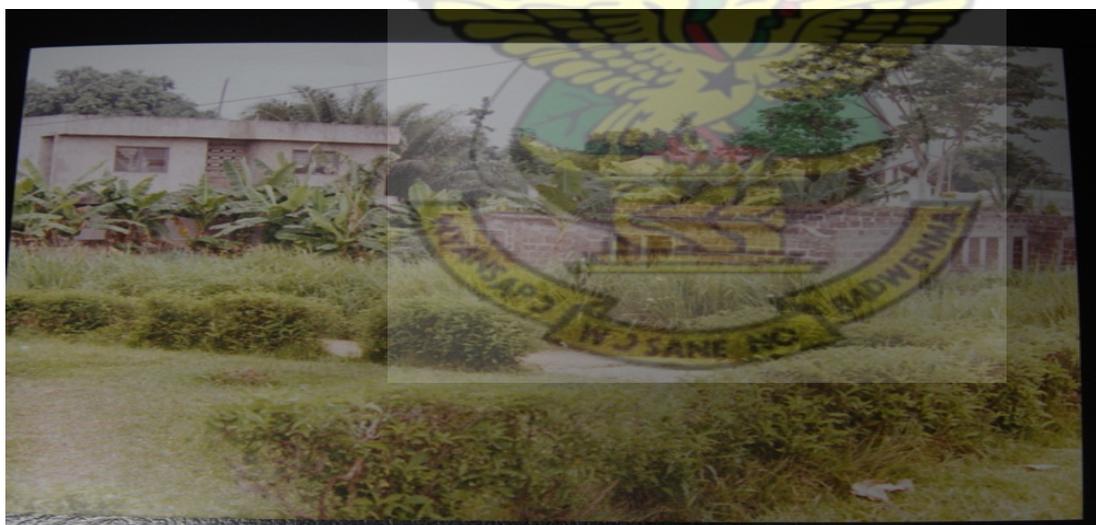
Buildings constructed in a river course around Prince Boateng (Adweso)
